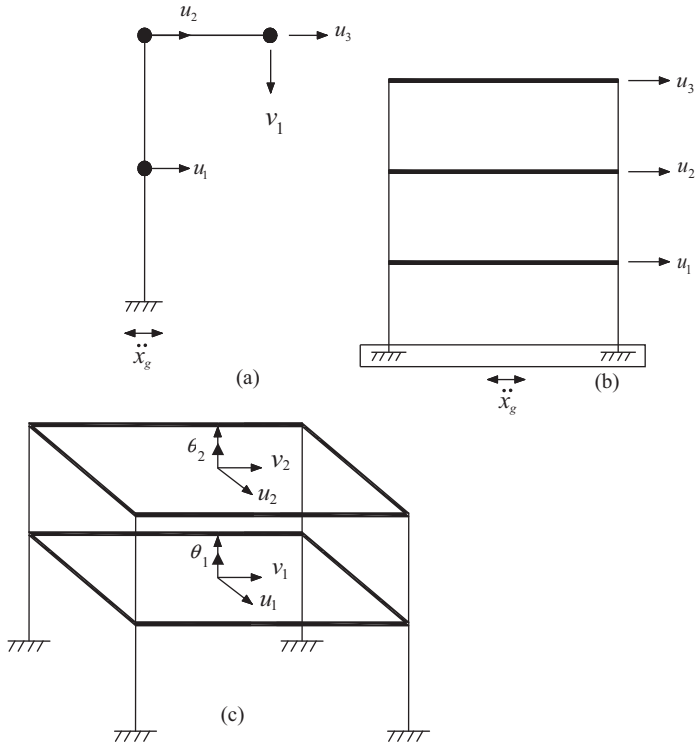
Frame structure: (a) bracket frame; (b) shear building frame; and (c) 3D model of a shear building frame
